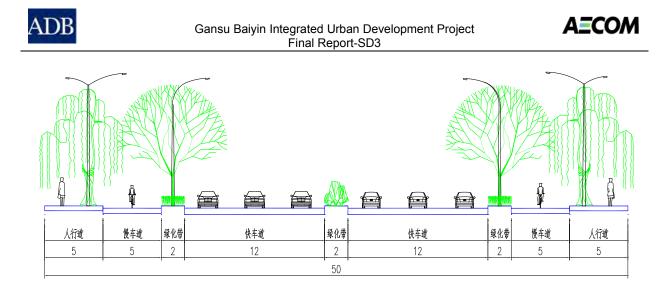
Option Two – Cross section of Xihuan Road (Recommended)
